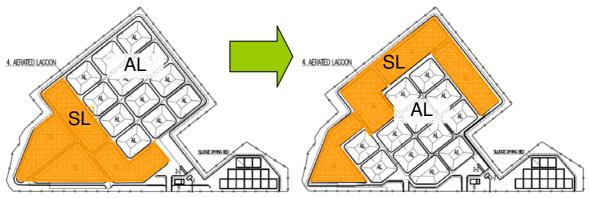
Modification of Layout of Aerated Lagoon and Sedimentation Lagoon in the Expansion Area
